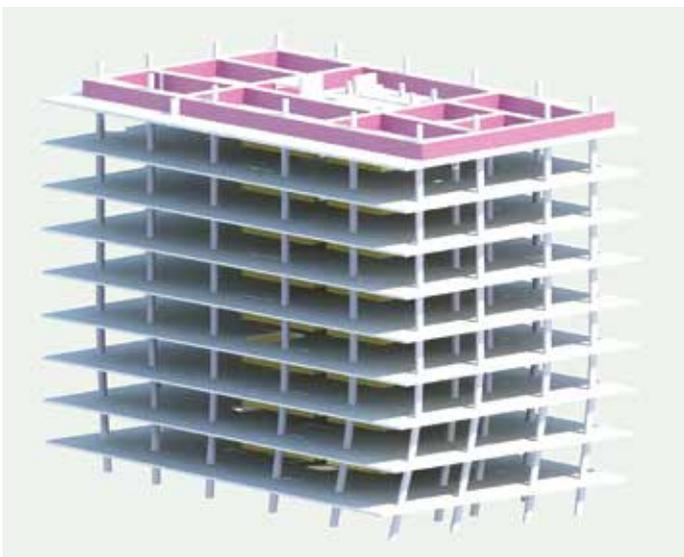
Revit model with Roof Girder system (Source: DeSimone Consulting Engineers, PLLC)
